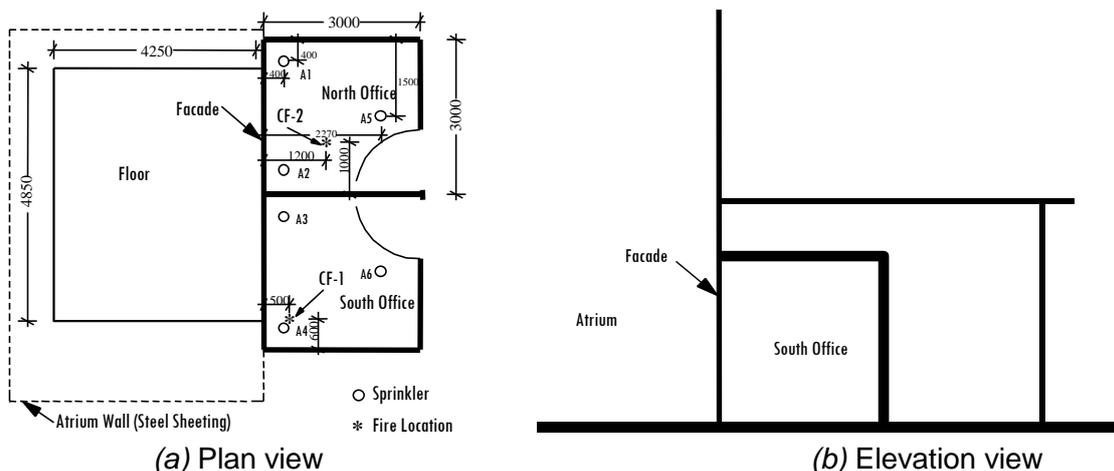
Sprinkler locations during Capita Façade tests and elevation view.
